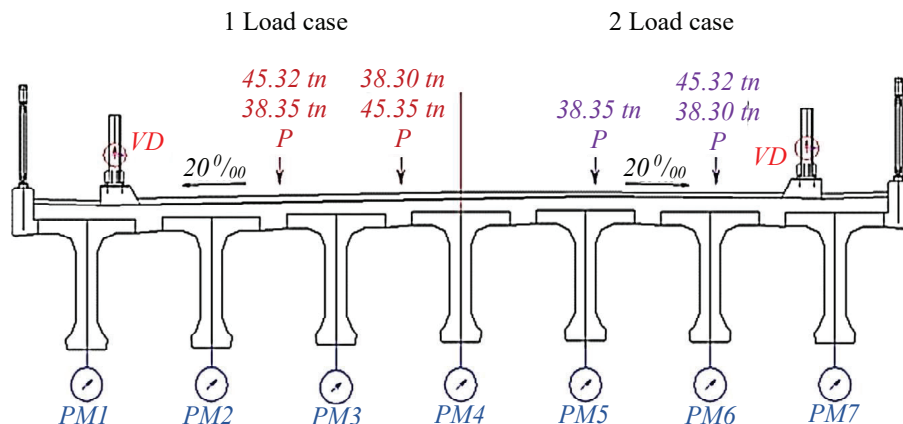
Testing instruments Layout PM1...PM7 – mechanical deflectometers of “Maximov” system; VD – sensitive vibration sensor – 2-axis accelerometer; P – test load, loaded HOWO dump trucks loaded with crushed stone
